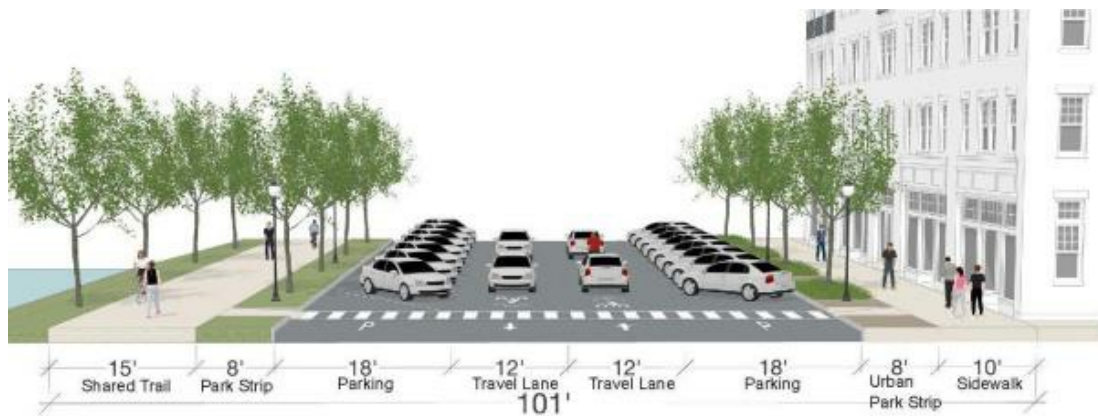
(3). Lake Road Central Section (Illustrative)
